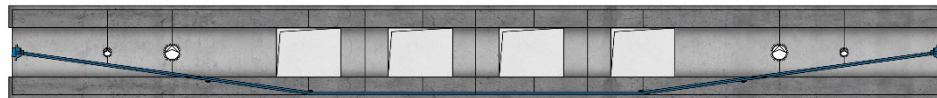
Ribbed girder with large openings and installed prestressing steel; span to depth ratio $l/d \leq 30$
